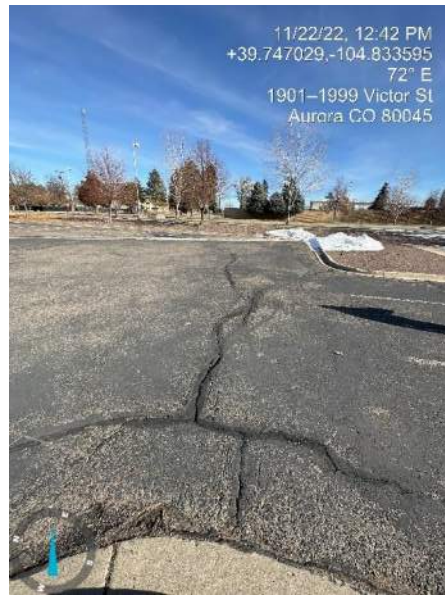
EXHIBIT B – TYPICAL PHOTOS OF EXISTING CONDITIONS
